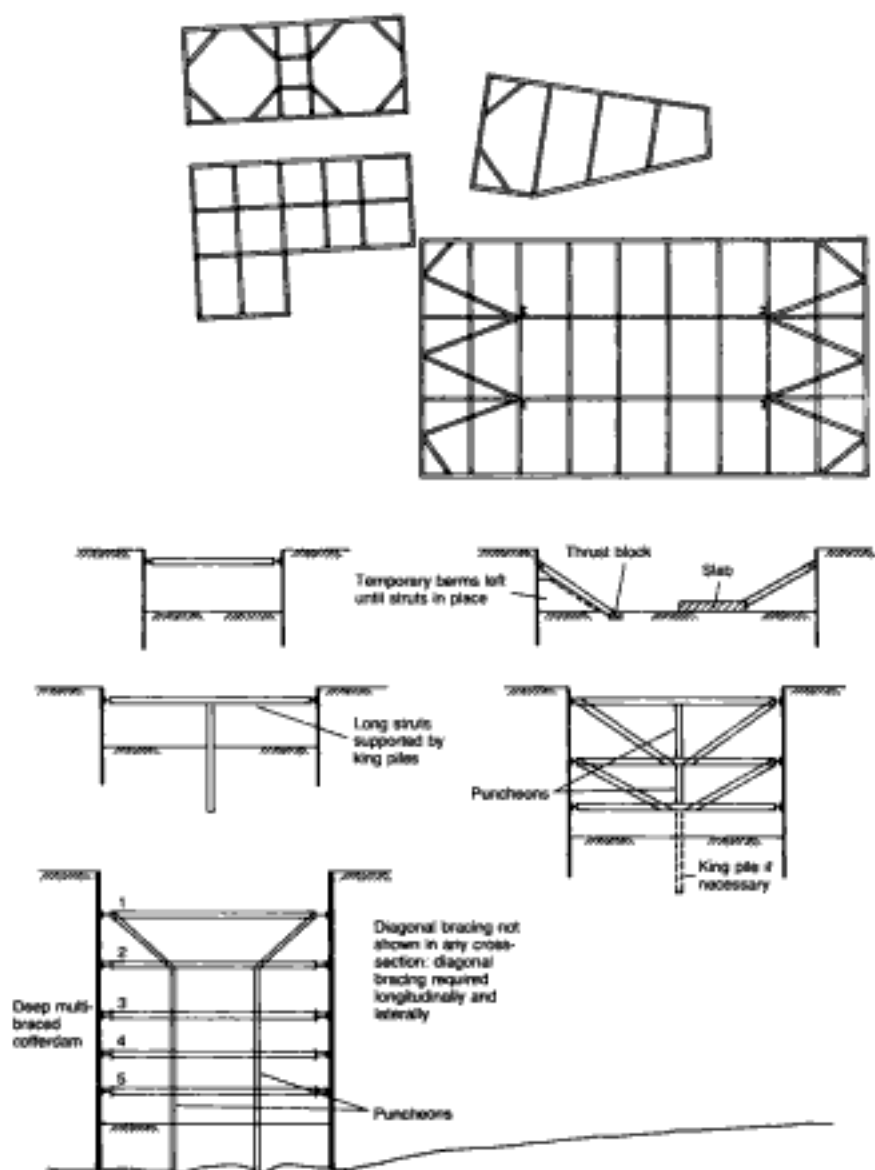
Typical cofferdam framing in plan and in vertical cross-section (CIRIA⁴)
